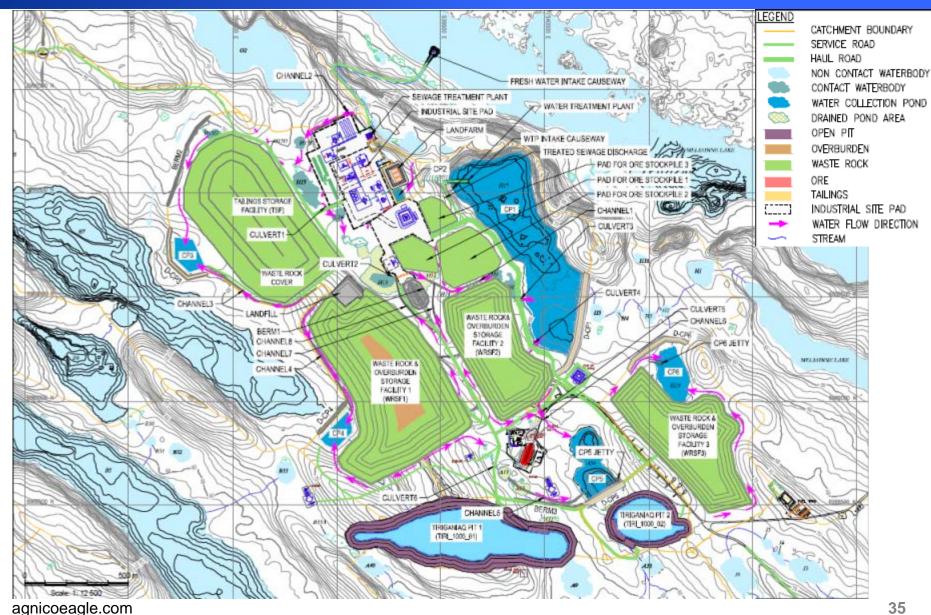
DETAILED SCOPE - SITE LAYOUT (YEAR 9)
